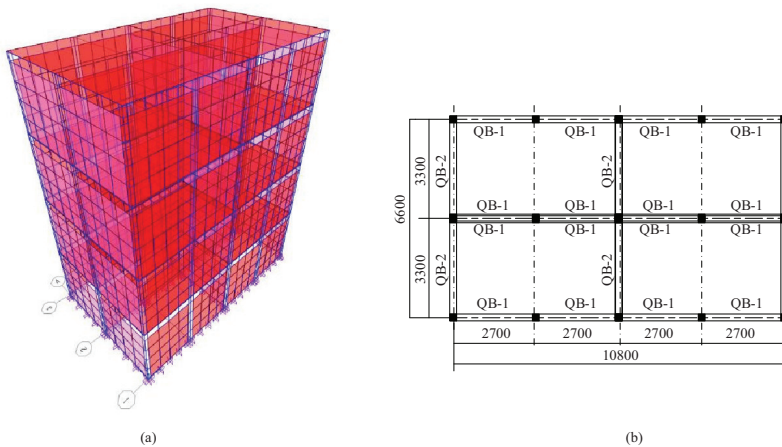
3D structure and layout plan: a) Three-dimensional figure, b) Layout plan
